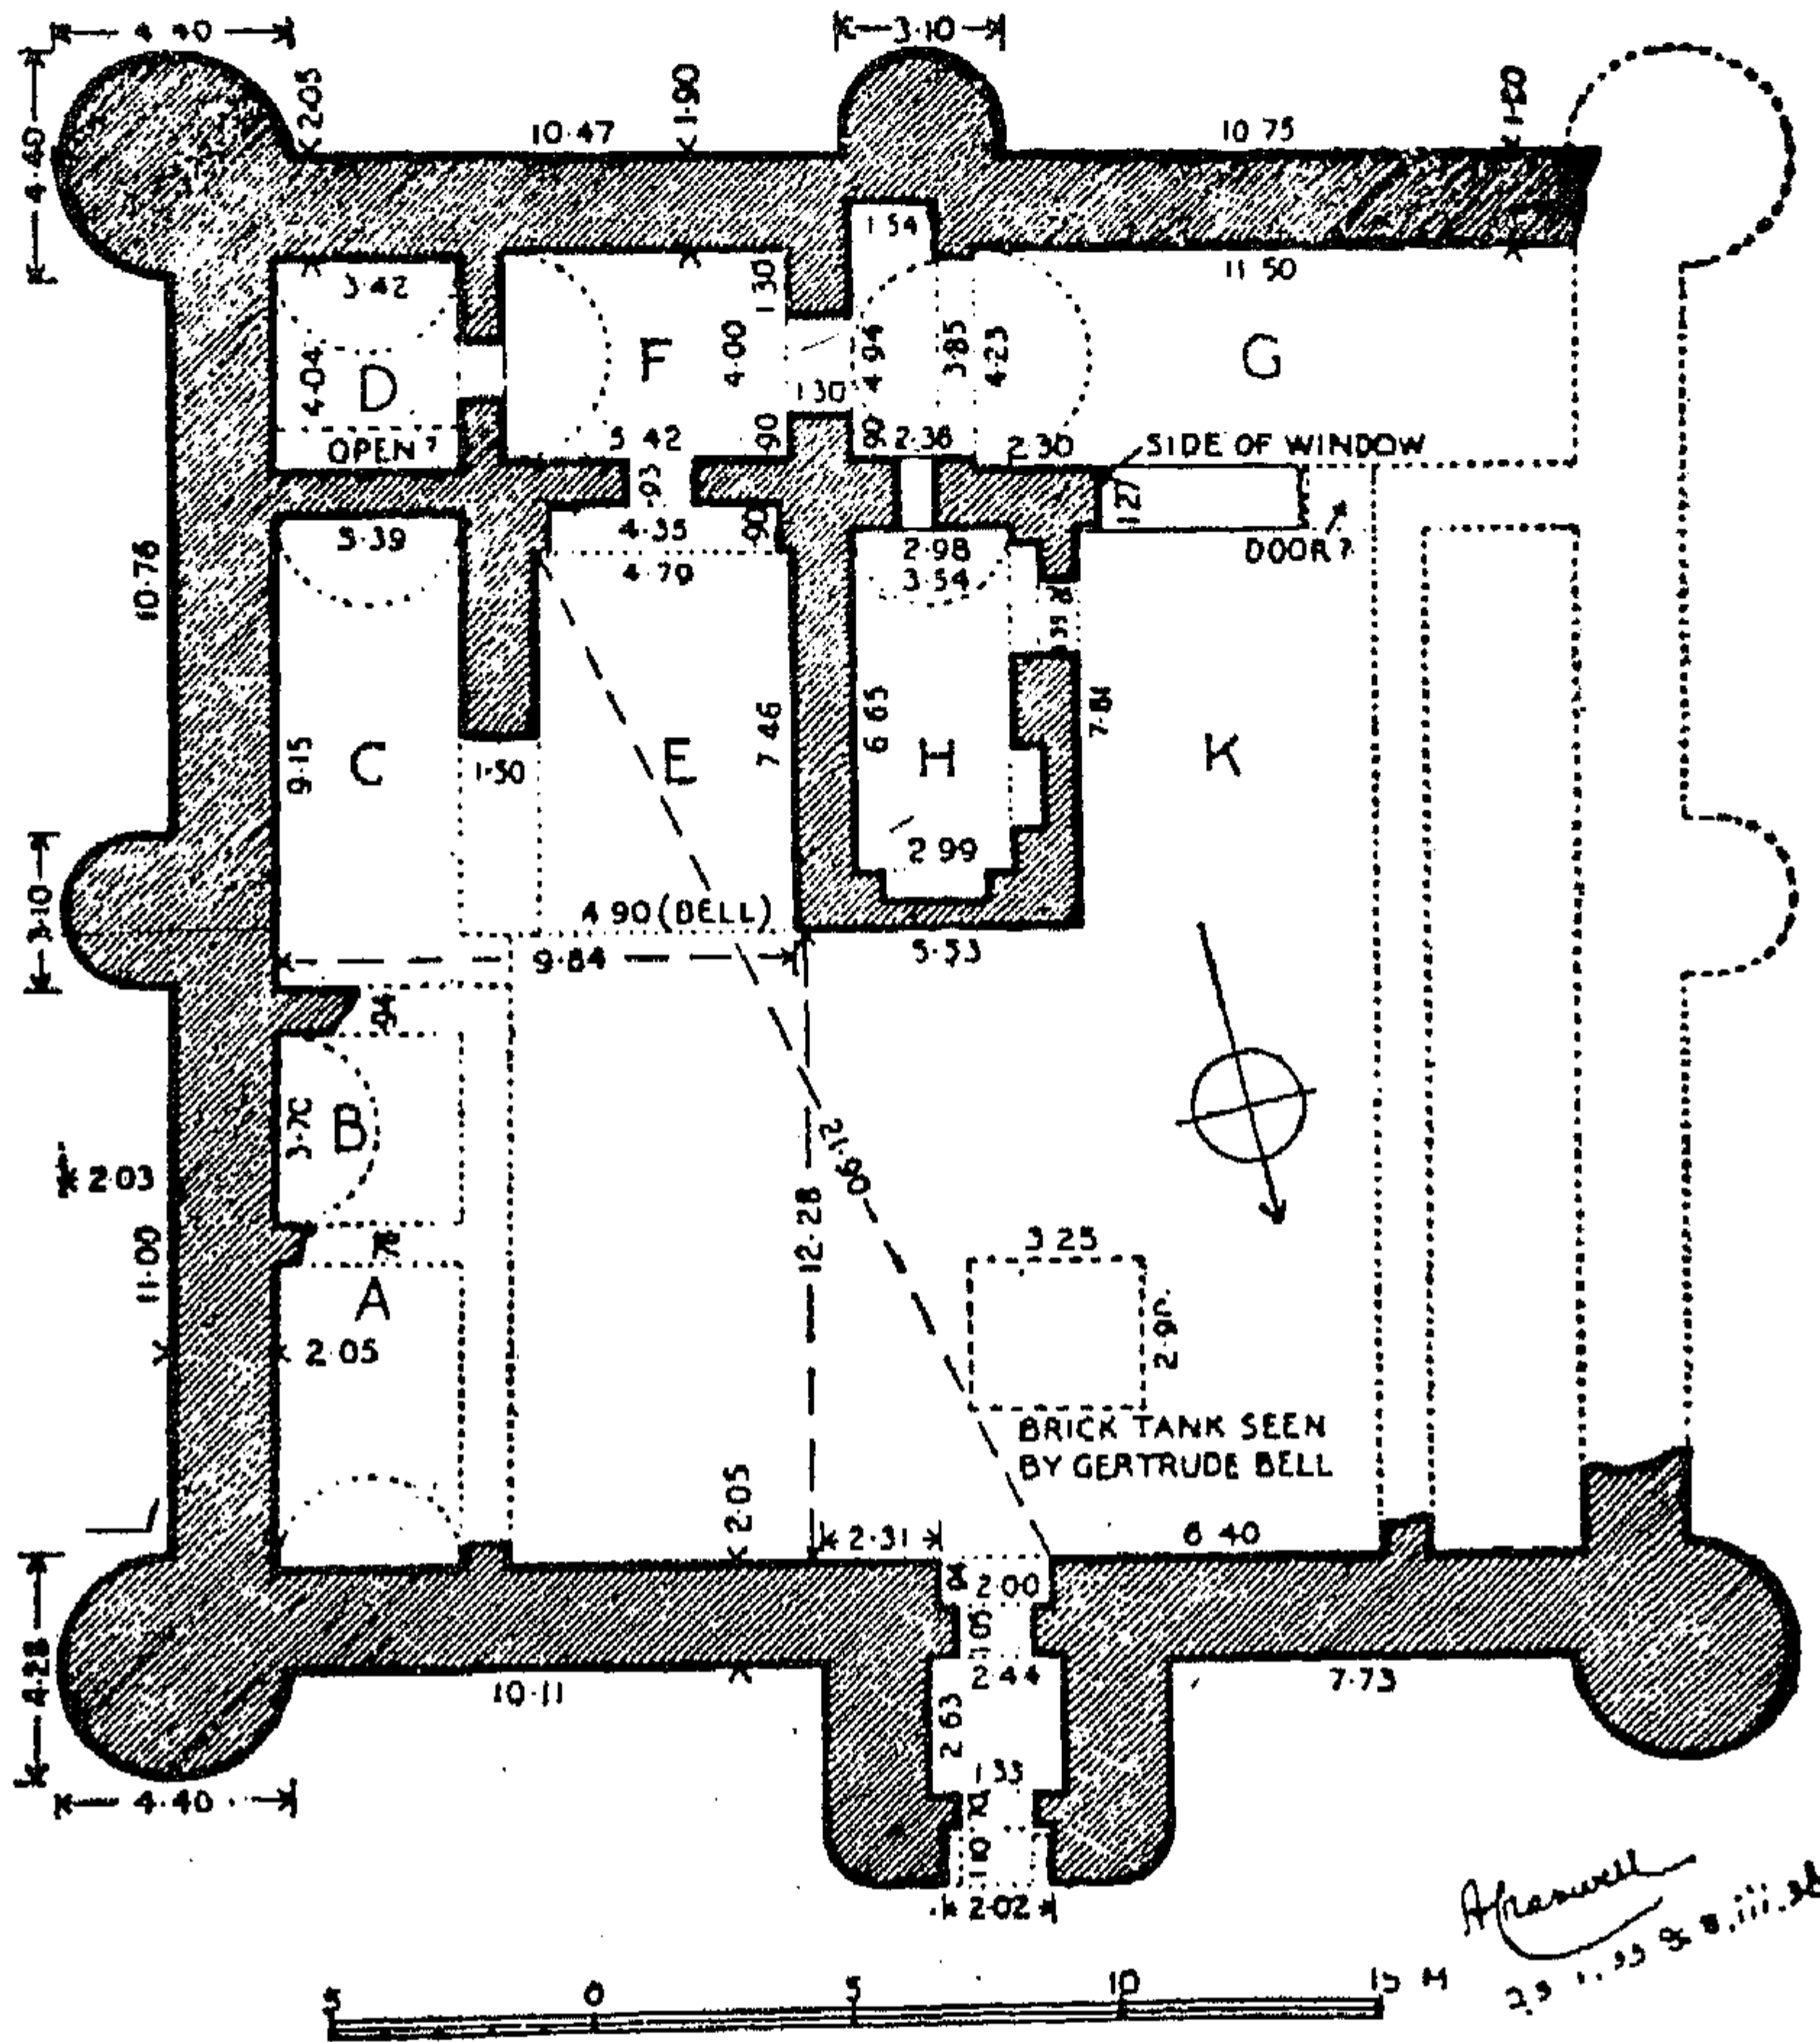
AL-TASHLAN: plan. Scale 1:200.
